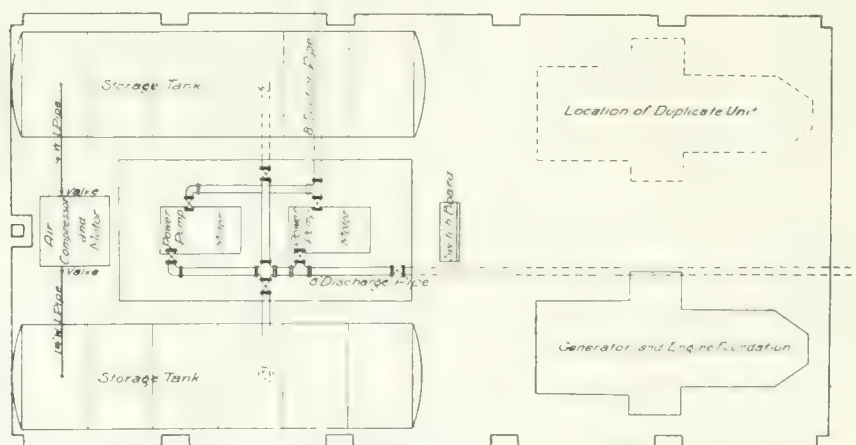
Plan Showing Arrangement of Machinery in Power House.
